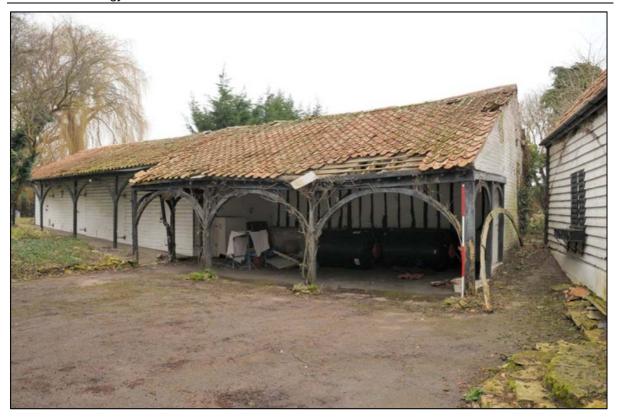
Stables, south elevation, looking north-westShows modern extended south front and timber frame visible in rear wall of compartment C1
